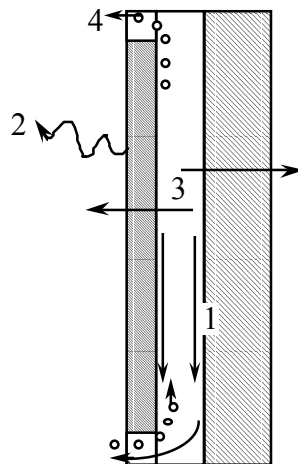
Drying Mechanisms in Masonry Walls with Vented Airspaces
